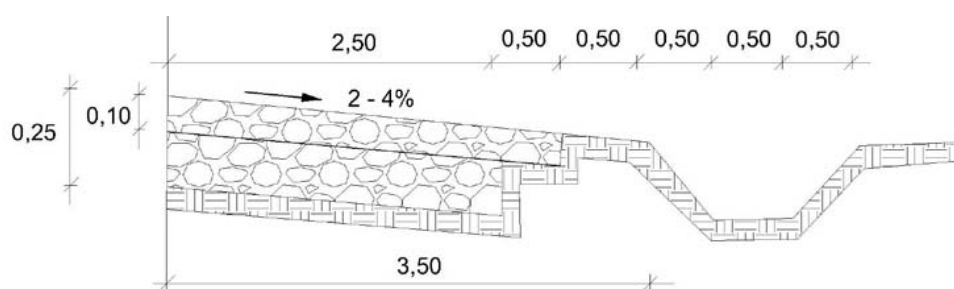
Construction and constructive elements of the Gravel surfacing -McAdam (2)
